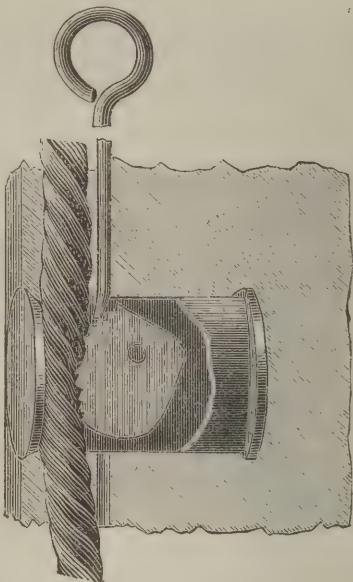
The Rodgers Sash Cord or Chain Fastener.
